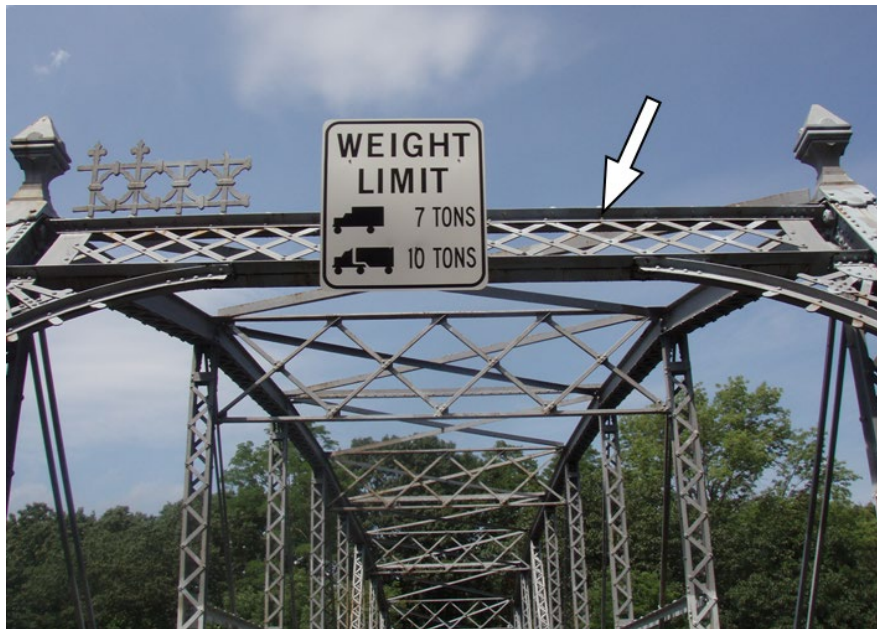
Portal Bracing with Attached Load Posting Sign
